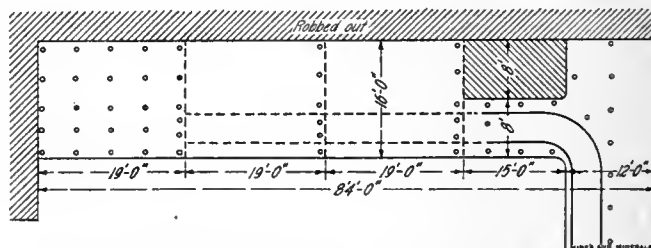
POSTING AND SIZE OF FALLS IN 84-FOOT CENTER ROOMS
